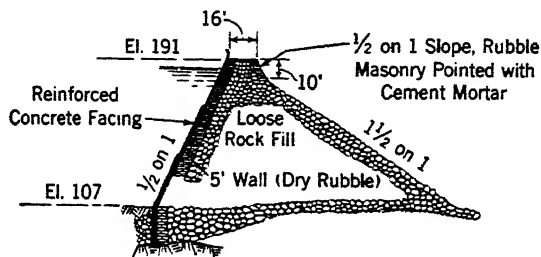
Section through Beaver Park Dam, Colorado. (*Eng. News*, Vol. 73, p. 660.)
